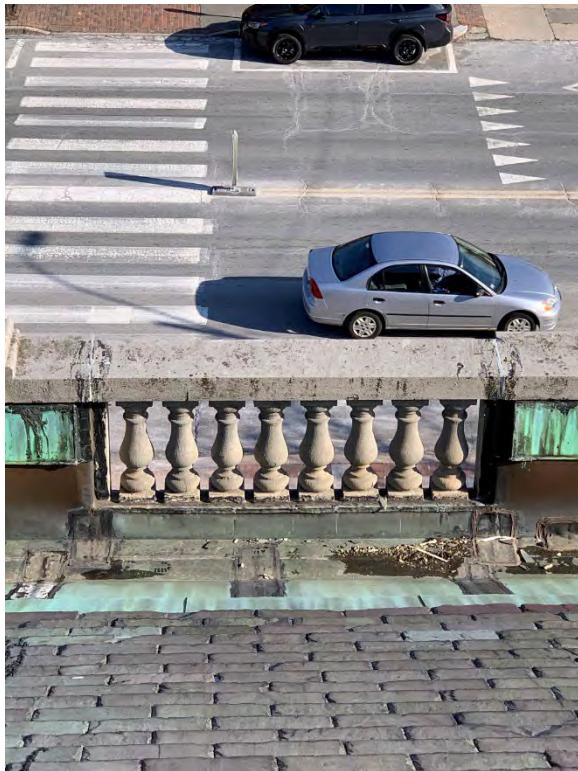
The flashing at the parapet should continue beneath the parapet stones to stop water penetration below.
